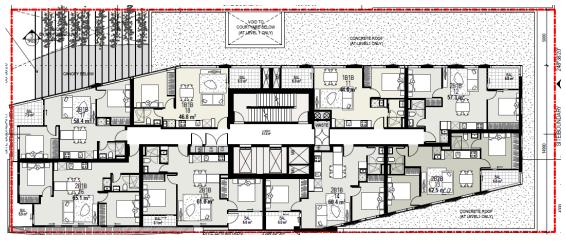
Endorsed Level 1 Plan (TP02.04)
